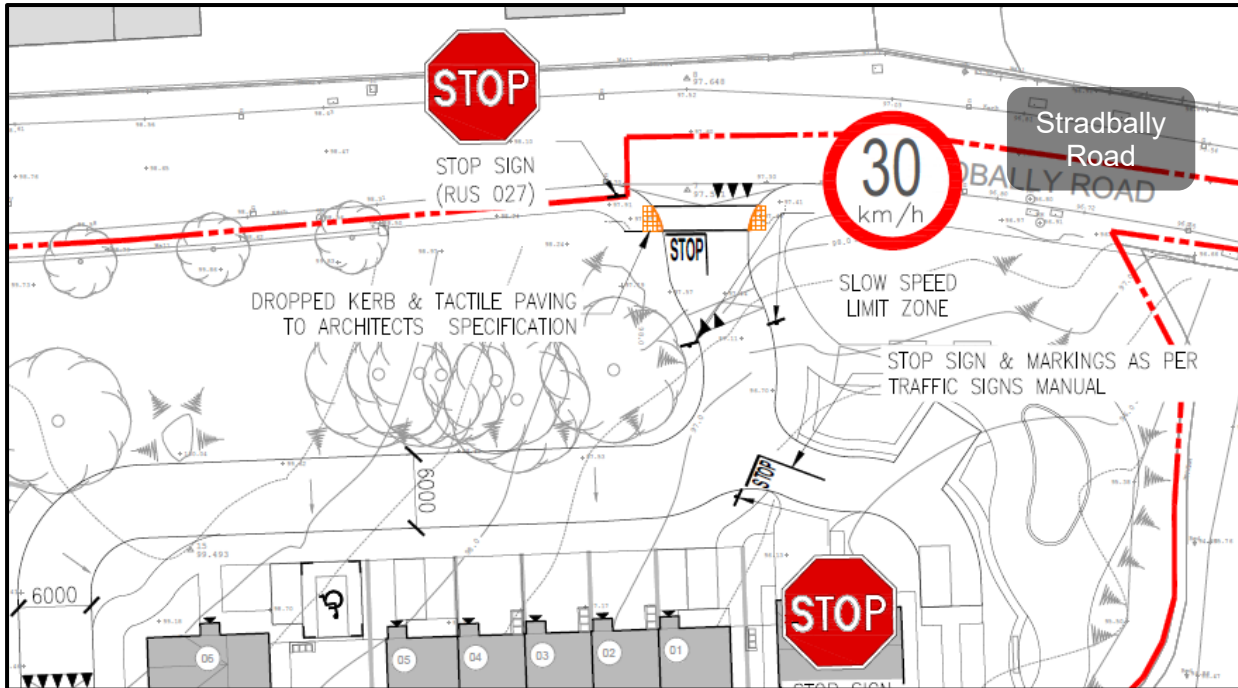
Proposed Stradbally Road/ Internal Access Road junction Layout (Source: Van Dijk Architects)
